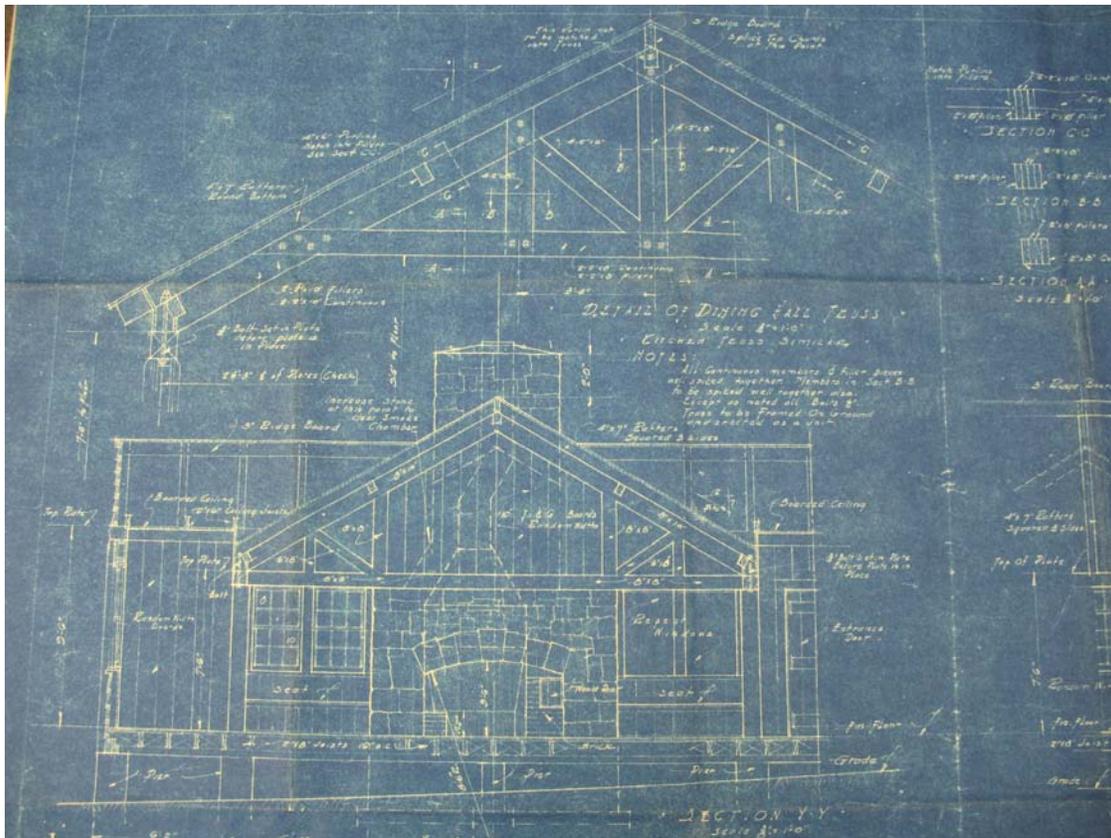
Blueprint Detail of Camp 1 Dining Hall Truss and Fireplace, 17 March 1936.
